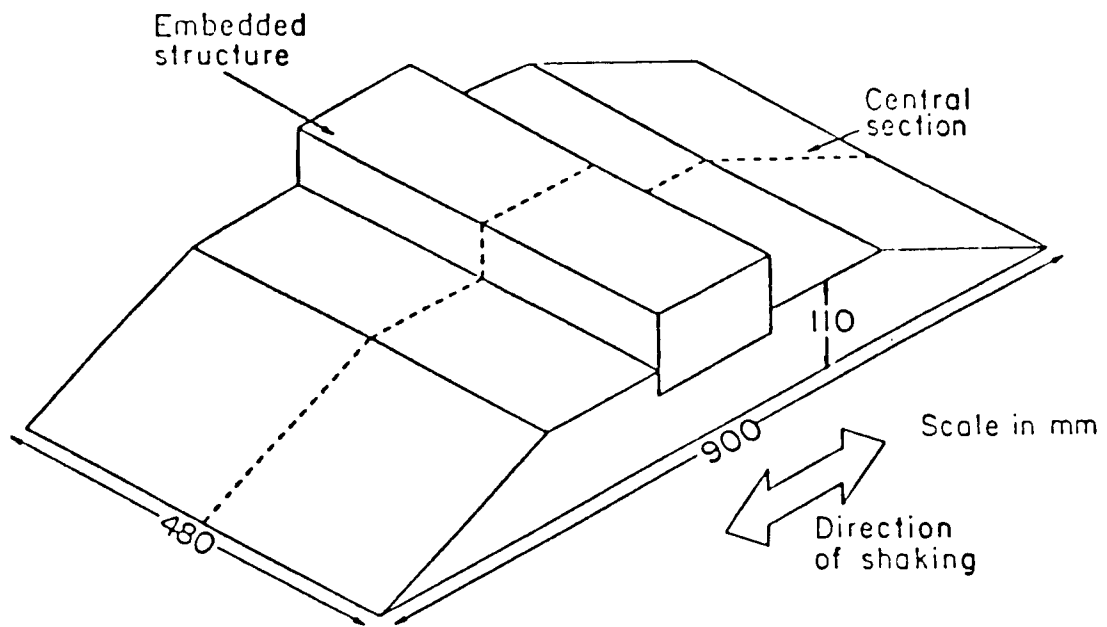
Schematic of a Model Embankment With Embedded Structure
